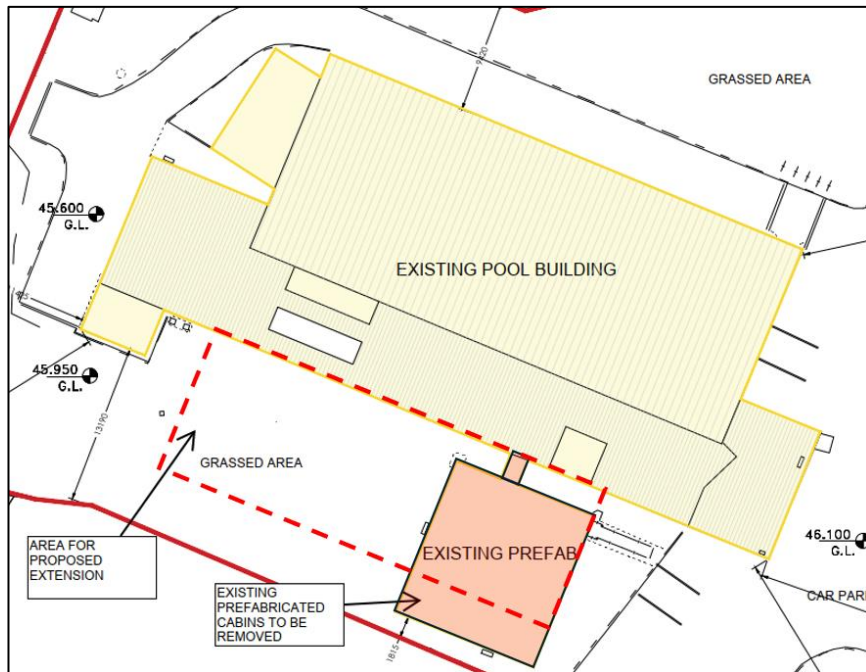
Existing Site Plan Extract – Area of Proposed Development
